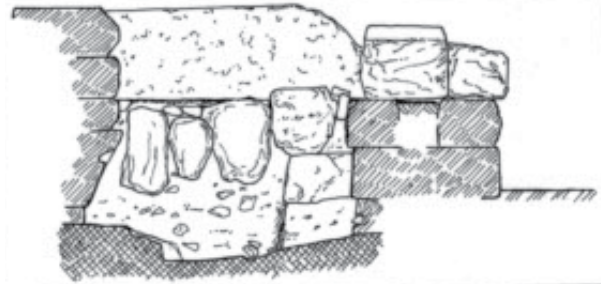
c.7.3 Elevation of Skene West Wall seen from the west. N. Chatzidakis.
